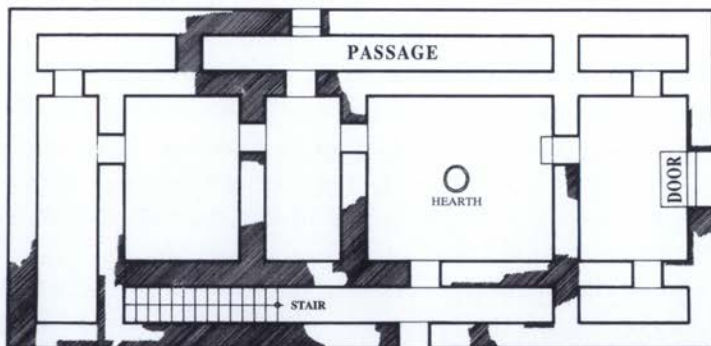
'The White House'. Ground-plan. 9 x 18.30 m.
